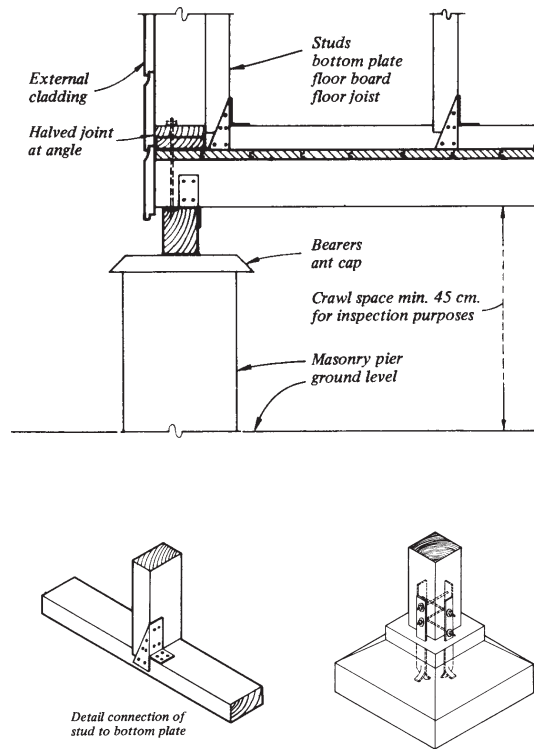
Footings for wooden buildings (Arya, 1987, p. 21)
